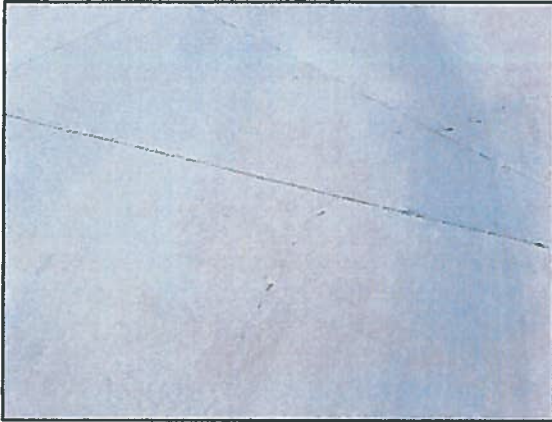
Fire Station 2 – Cracking in driveway concrete
